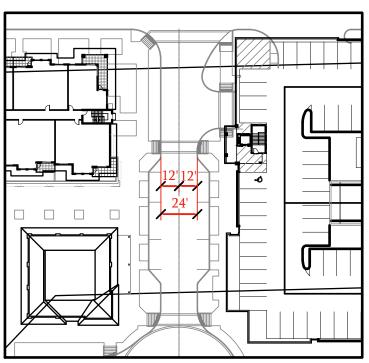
PEDESTRIAN STREET LOCATION PLAN
